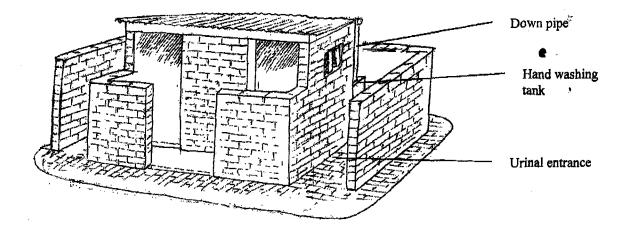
Typical layout of integrated latrine with rain water collection, hand washing facilities and urinal
